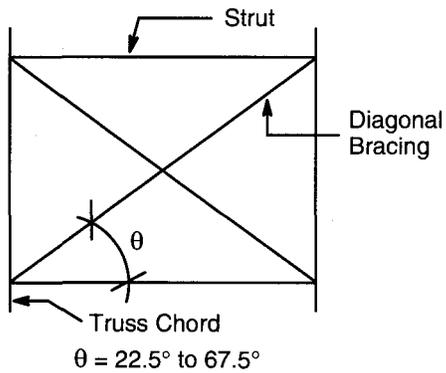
Horizontal X-Bracing Arrangement
